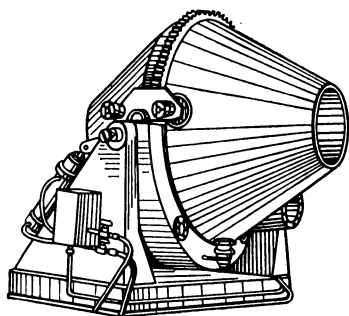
Stationary tilting concrete mixer with a 2 400-litre drum
